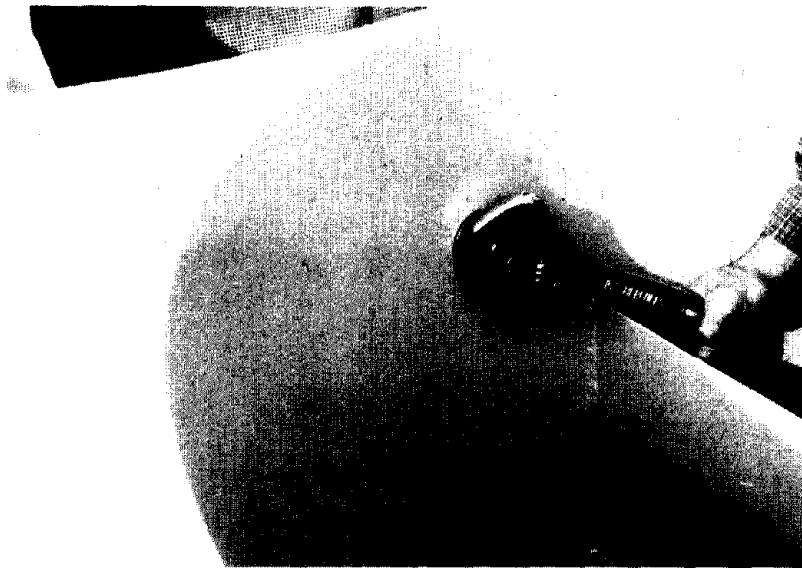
Individual cylinders are bolted to each other and to backup wall.
